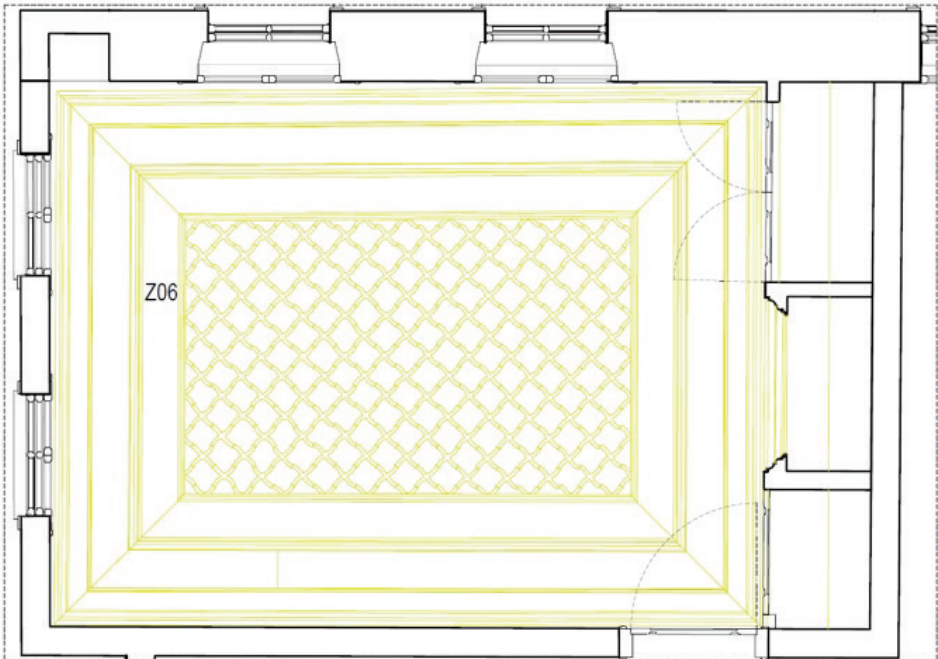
Ceiling drawings in site Z06. (By Nazlı Keçeci, 2020.)
